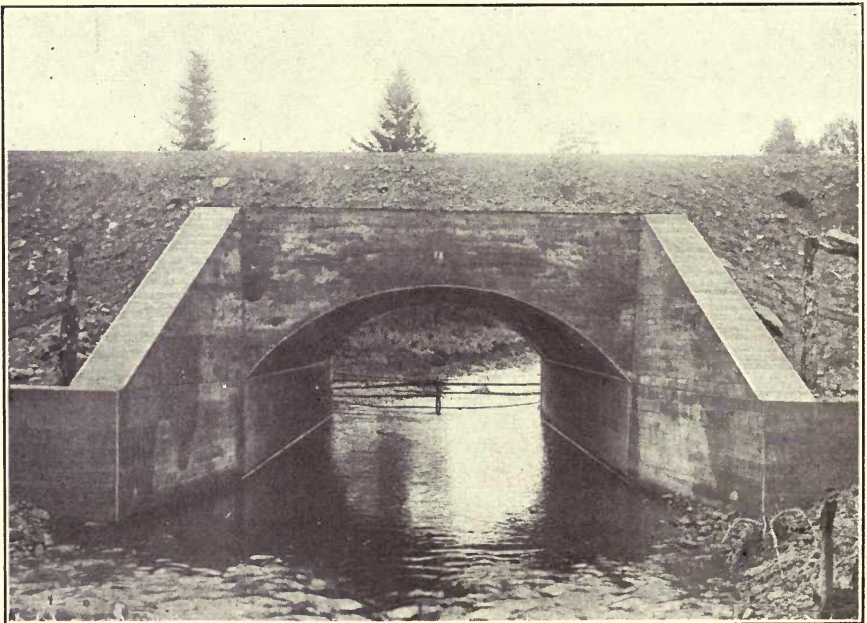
EIGHTEEN FOOT CULVERT, BANGOR & AROOSTOOK R. R.
